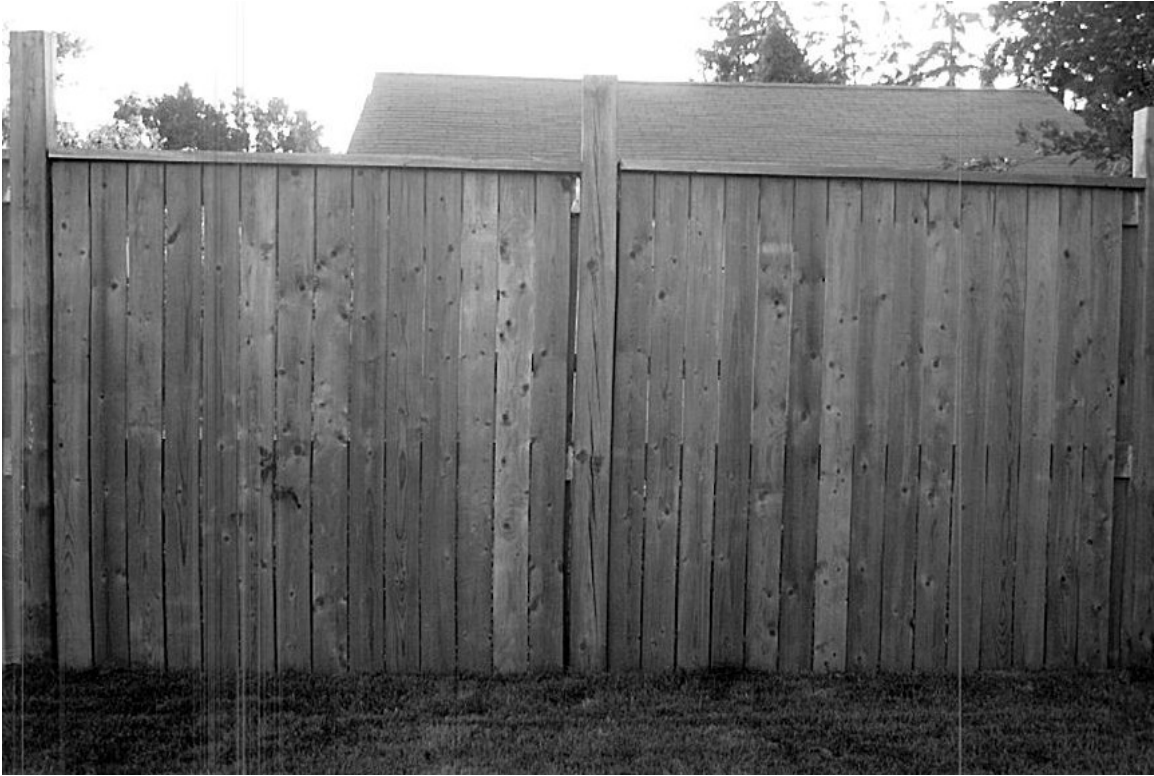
106 Gaydon Avenue – Rear Yard Fence
